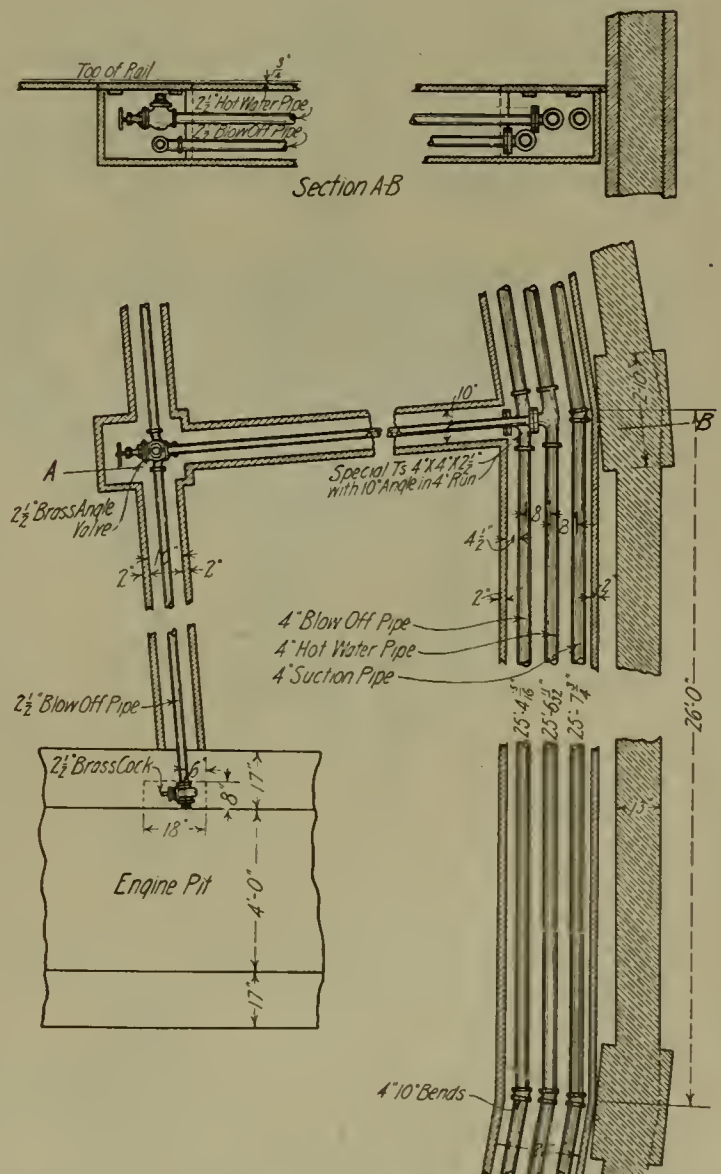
DETAILS OF PIPING ARRANGEMENTS, MCKEE'S ROCKS ROUNDHOUSE, P. & L. E. R. R.
